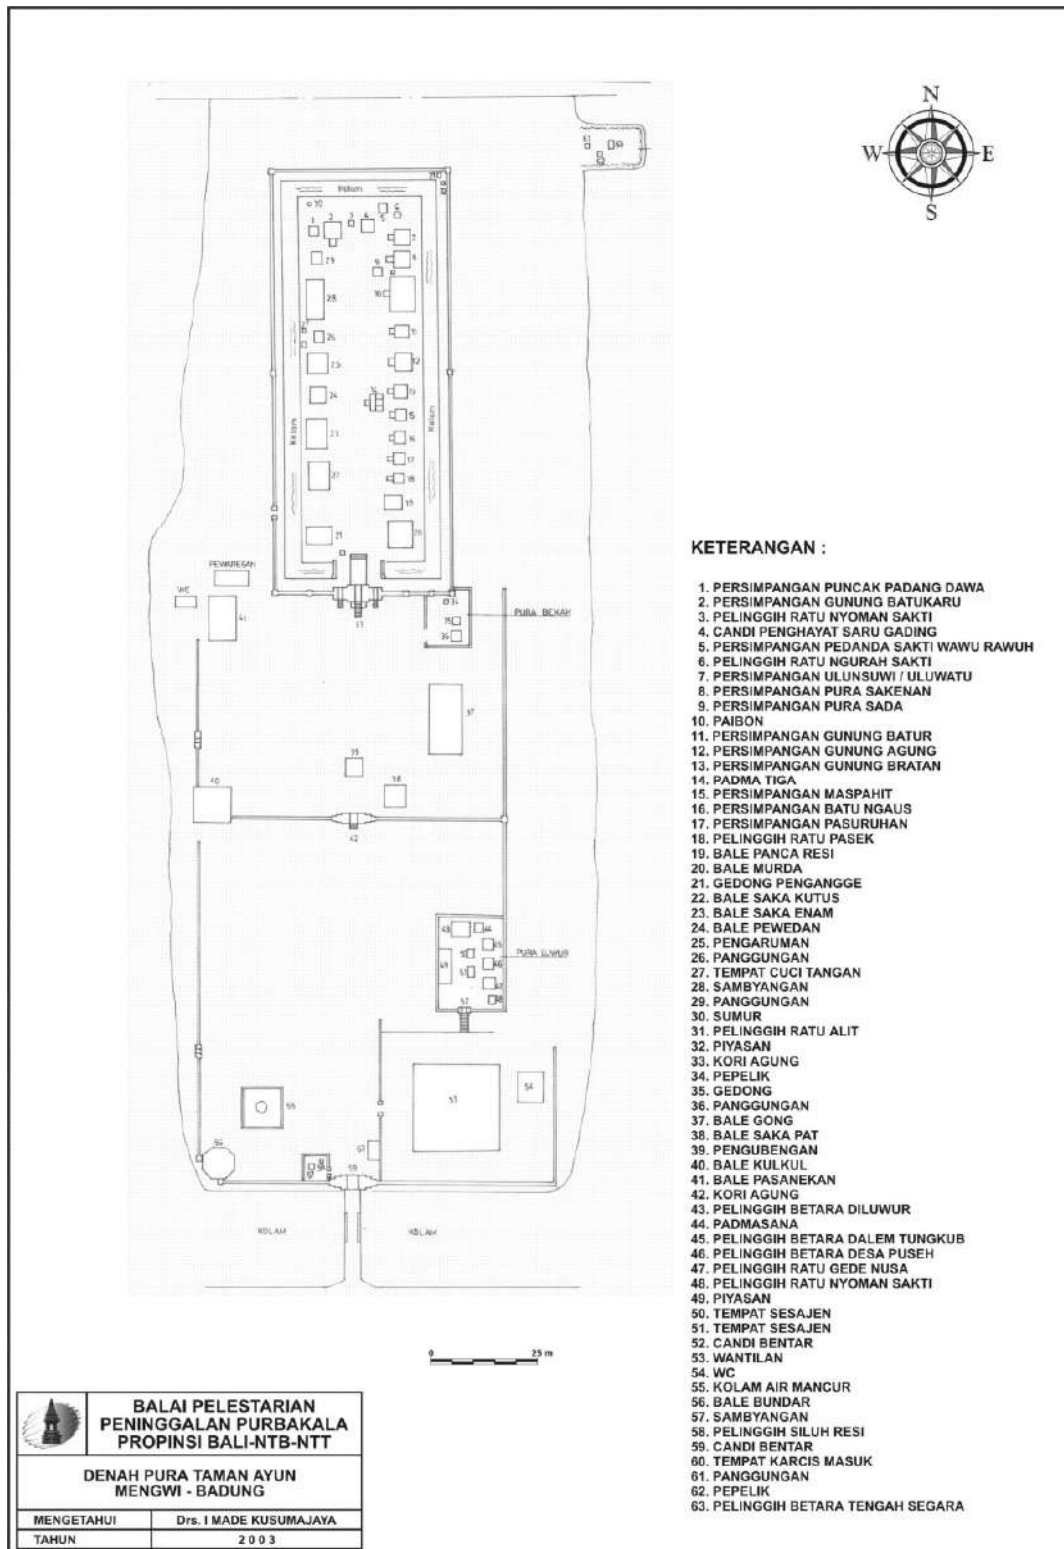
Site plan of Pura Taman Ayun (Source: BP3 Bali document)
